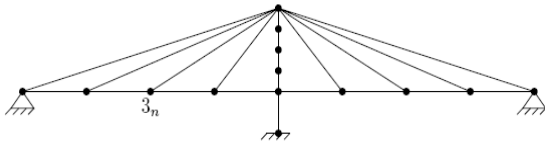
Simplified Finite Element Model of the Cable-stayed bridge
